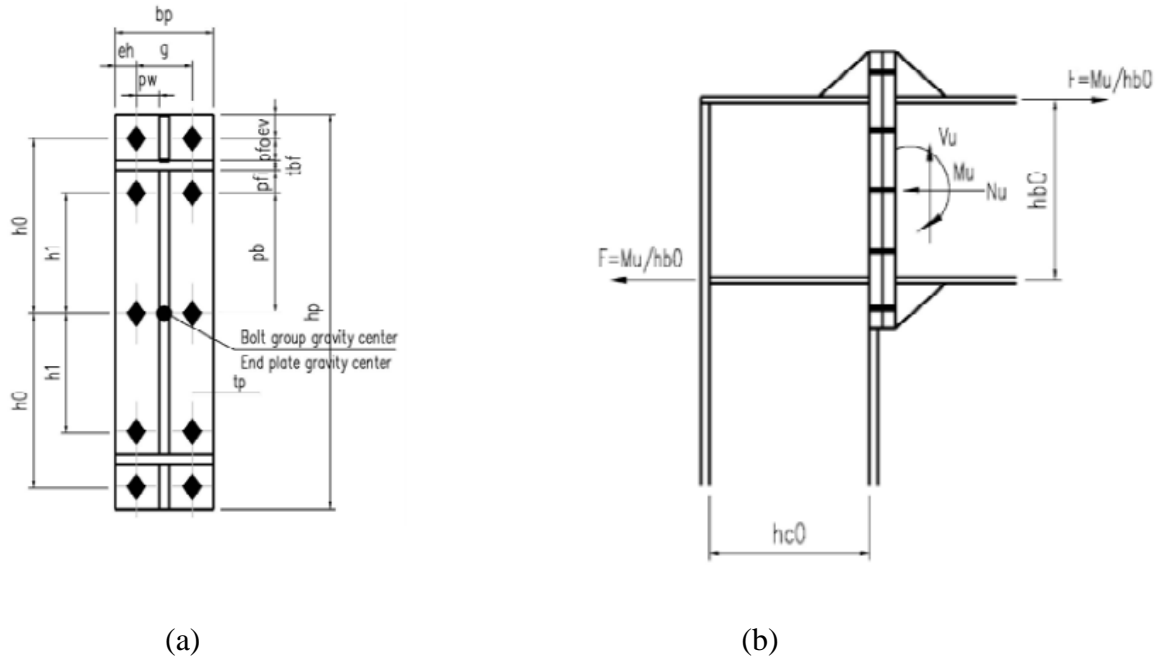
Typical connection detail showing (a) Column to column and (b) Beam to Column
